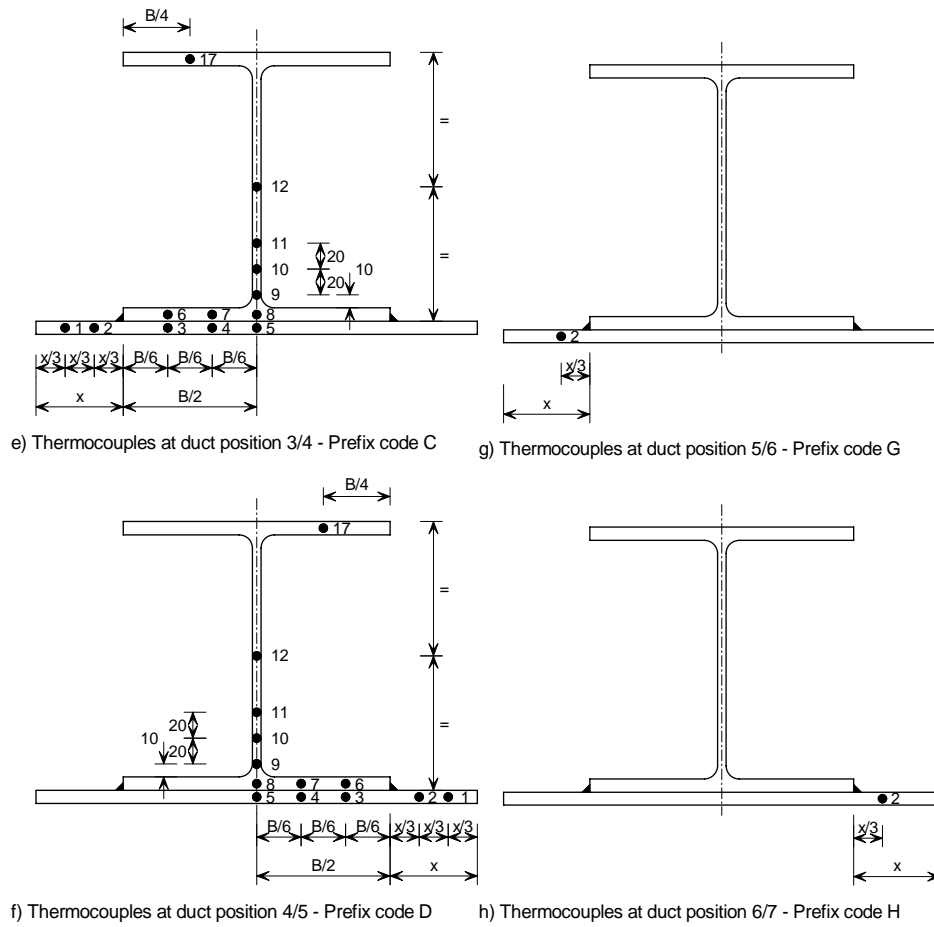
Location of thermocouples on instrumented cross sections C, D, G & H.
